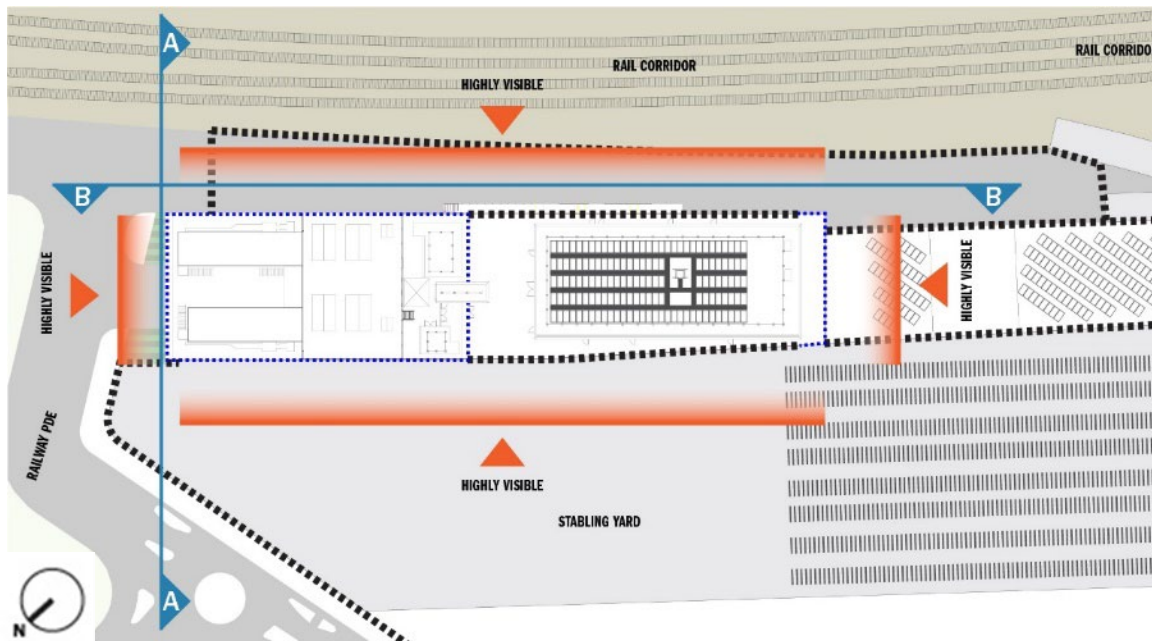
Marrickville Dive site - Building visibility sections plan
